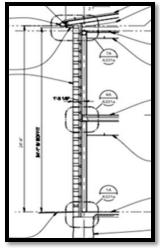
Exterior Wall Section – Courtesy of Barton Malow
